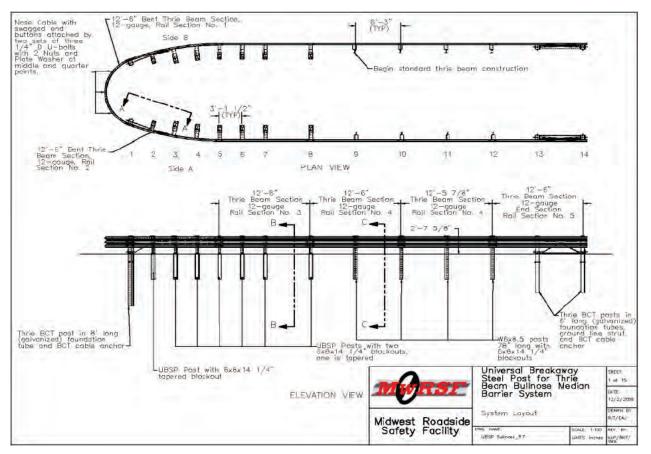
Barrier Design Detail of UBSPN-1 (13).
